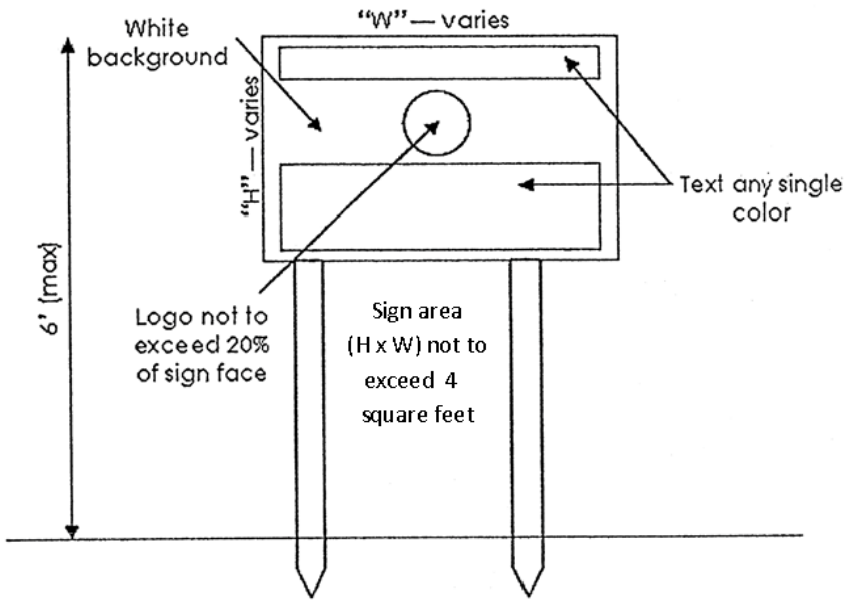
Signs for properties with building permit or site development plan in single family districts
